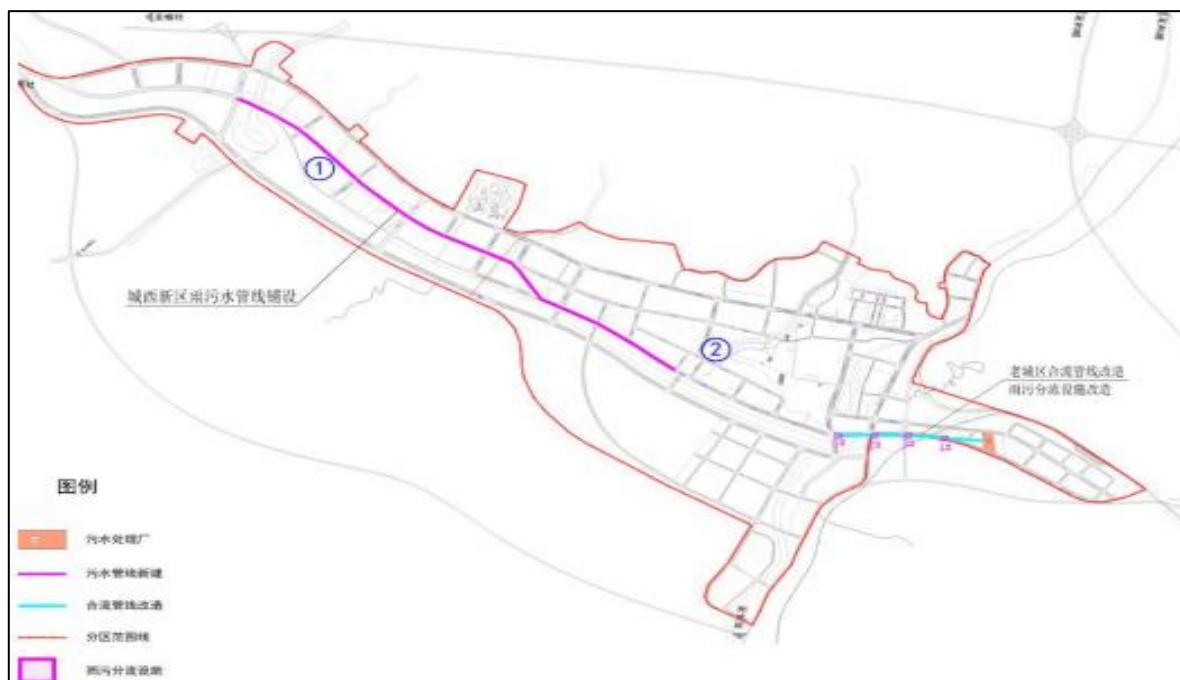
Location of the Overflow manholes Proposed for Reconstruction
